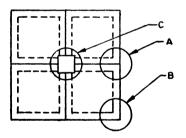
CRITICAL SECTIONS OF HYPAR FOOTING
